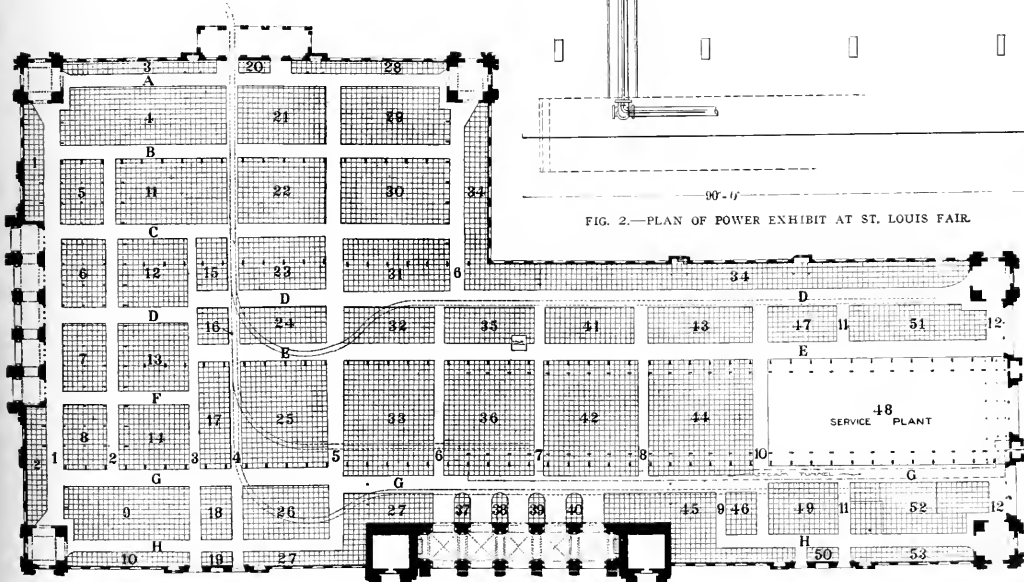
INSTALLATION PLAN MACHINERY HALL, ST. LOUIS FAIR.
